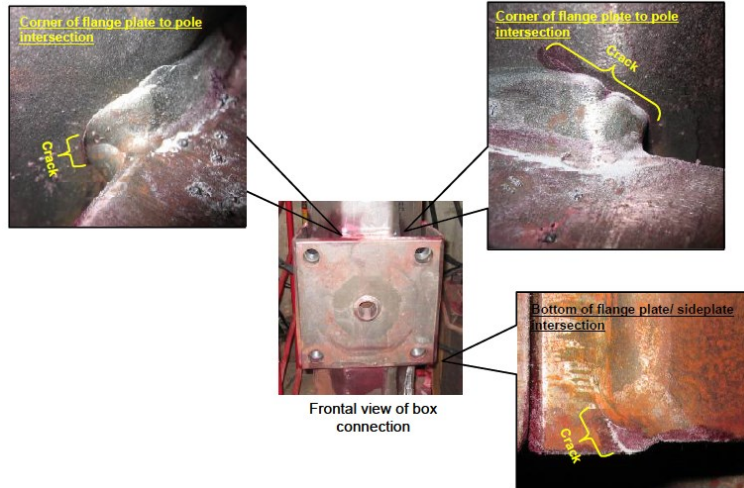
In-plane loading induced cracking on Specimen 3 (T1P3) (Ocel et al. 2006)
